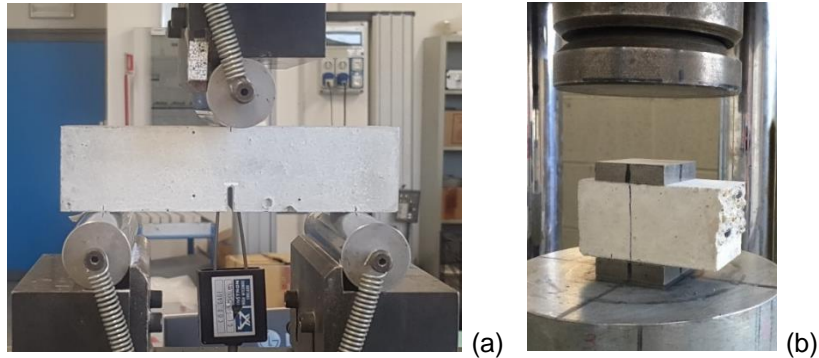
Testing arrangement for (a) three-point bending and (b) compressive tests.
